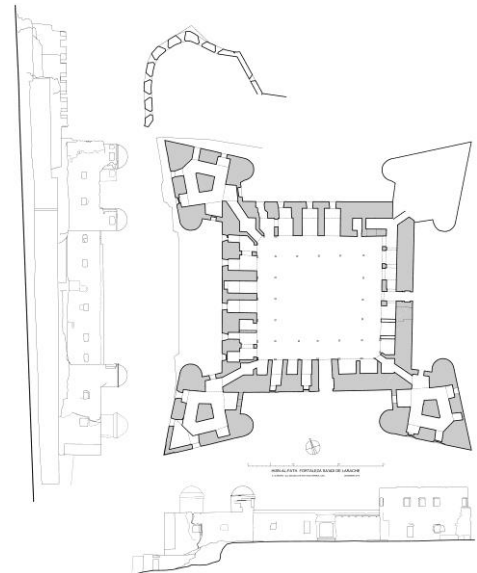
Plan and elevations of Larache's Hisn al-Fath at present.
